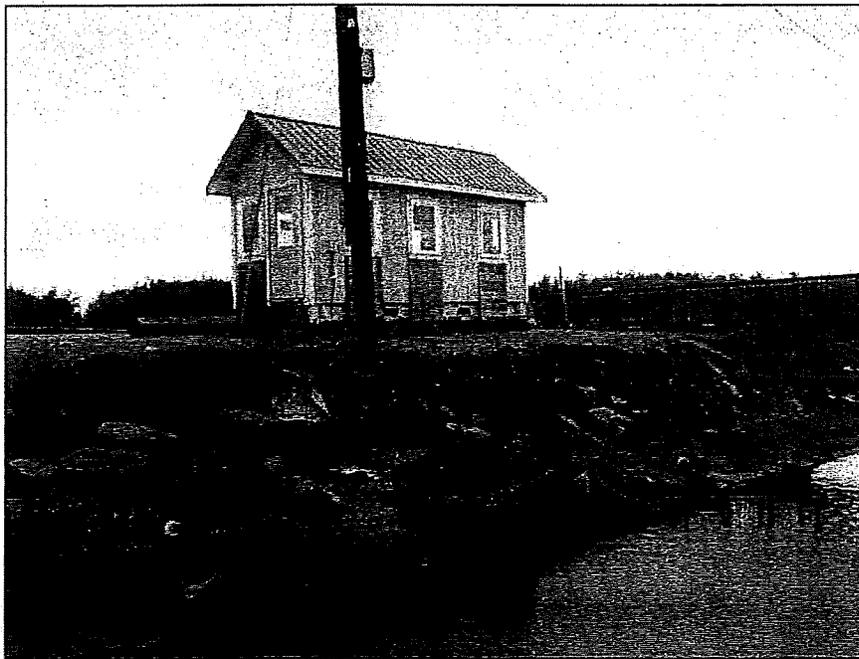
North bank of Bethel Harbor illustrating rock and Geoweb.
